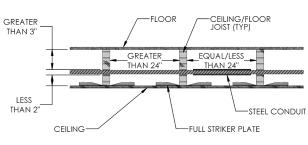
Typical locations where striker plates are required. Striker plates are installed at both horizontal penetrations unrestrained vertical runs of 26 inches or greater require no additional protection.
